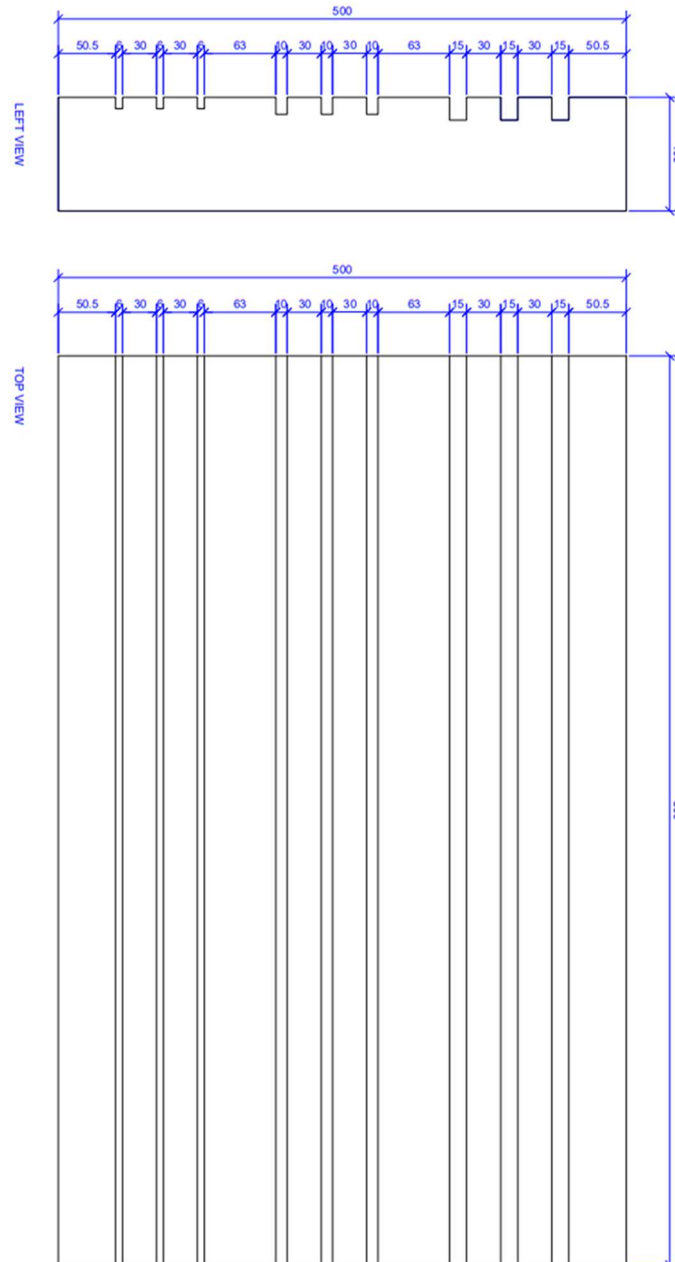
2D drawing of the floor slab with details of each of the three types of slots
